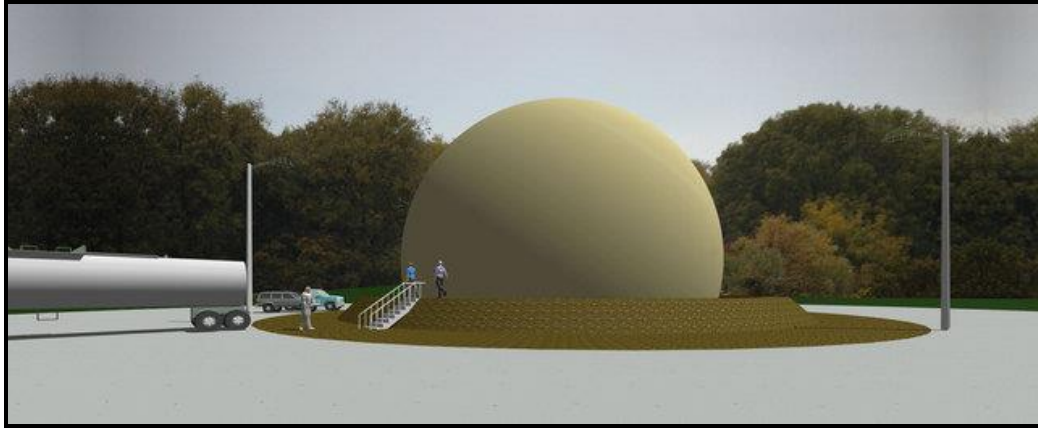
Monolithic Dome used as a storage tank.⁴⁶
